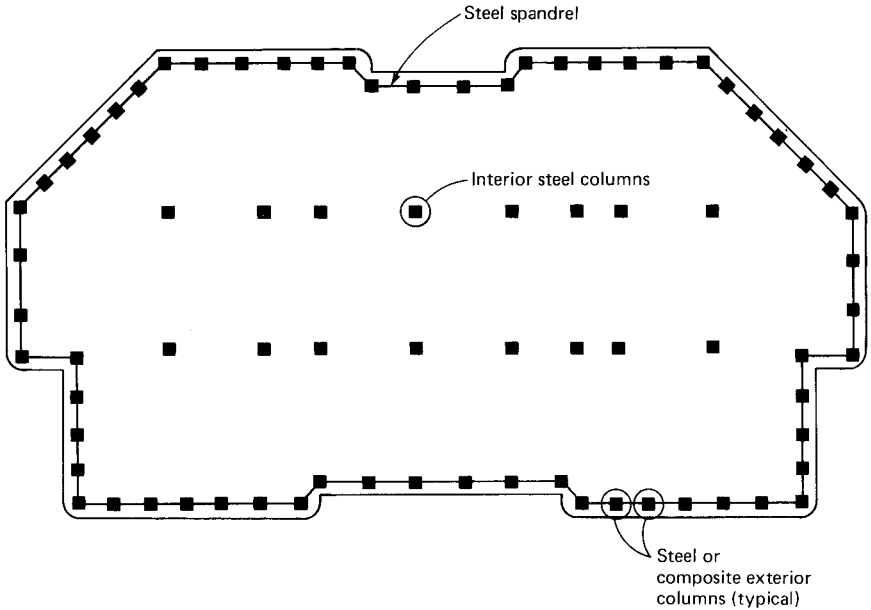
Framed tube with 10-ft (3-m) column spacing.
